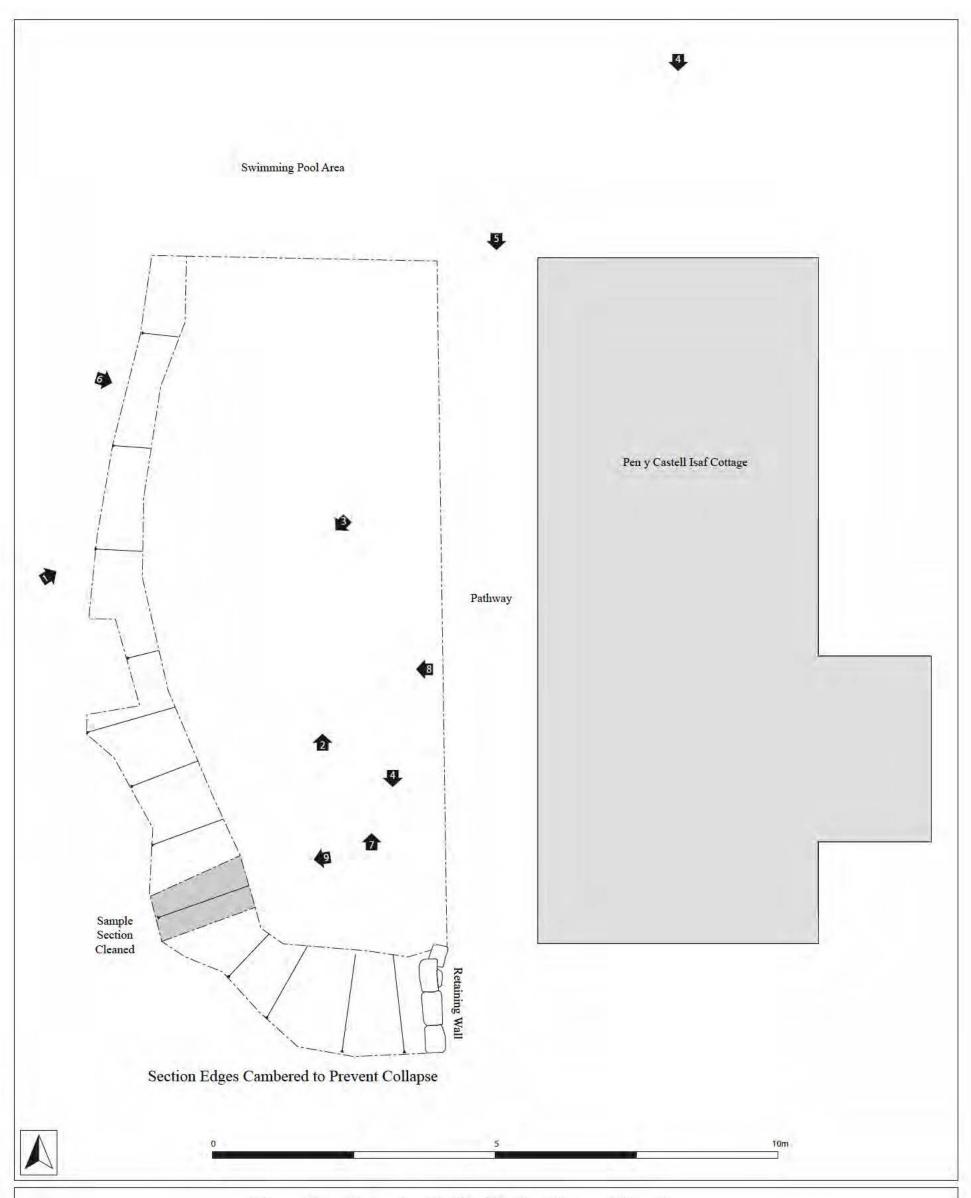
Post Excavation Site Plan Showing Photograph Locations
